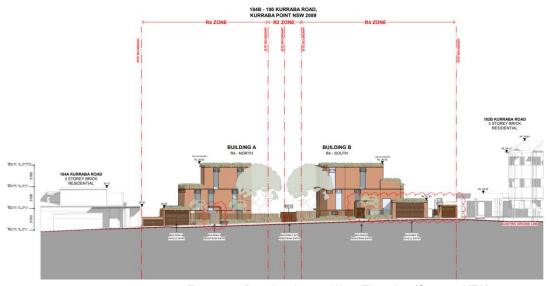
Drawing A204 - West Elevation (Source: KTA)
